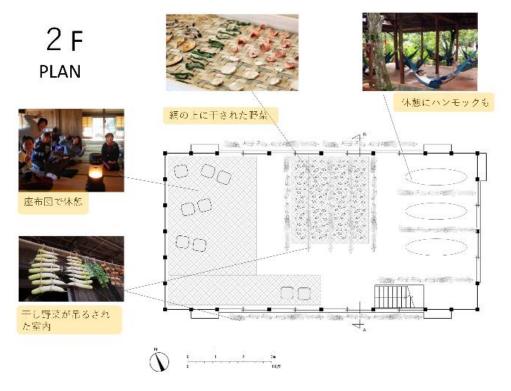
Proposed second floor plan of 'sanshitsu factory'.
